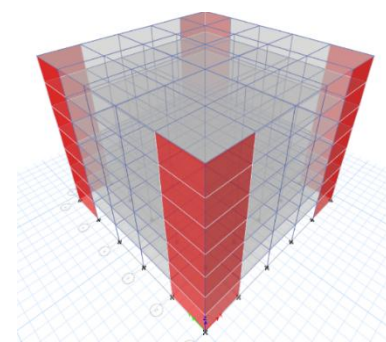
Model 3 - L-shaped shear walls at exterior corners
